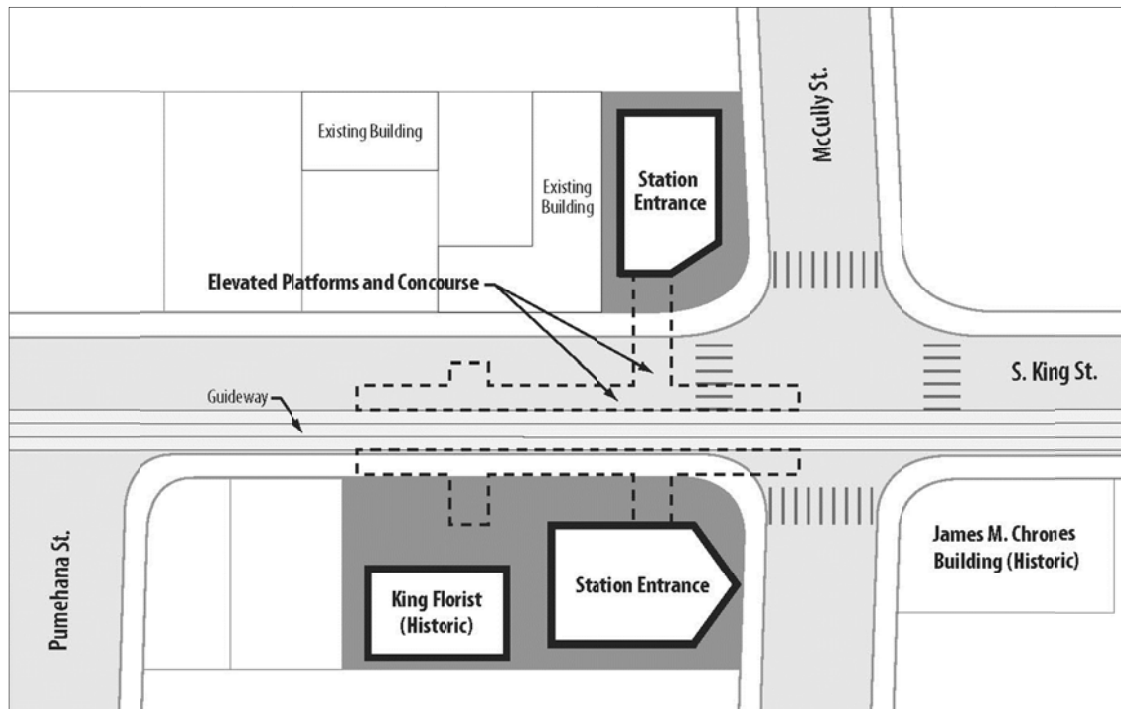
Beretania Street Tunnel Alternative McCully Street Station
